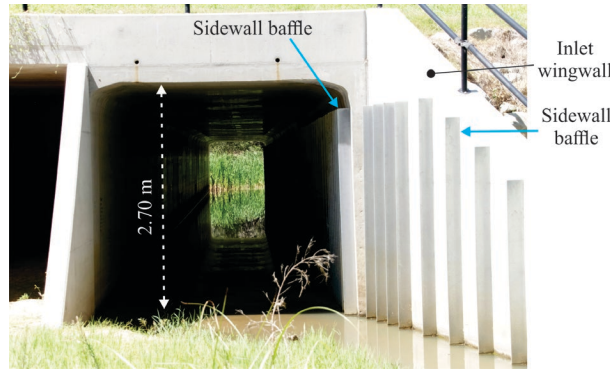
Multicell box culvert equipped with sidewall baffles in Flagstone QLD (Australia) on 2 October 2021 - Details of culvert inlet and barrel start, with sidewall baffles (baffle width: $h_b = 0.150$ m, cavity length: $L_b = 0.60$ m) installed to assist with upstream fish passage
